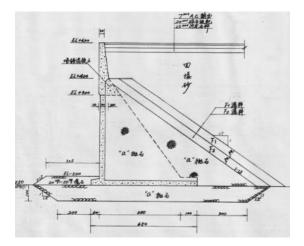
Quay 5B. Angular retaining wall. Image: CECI
